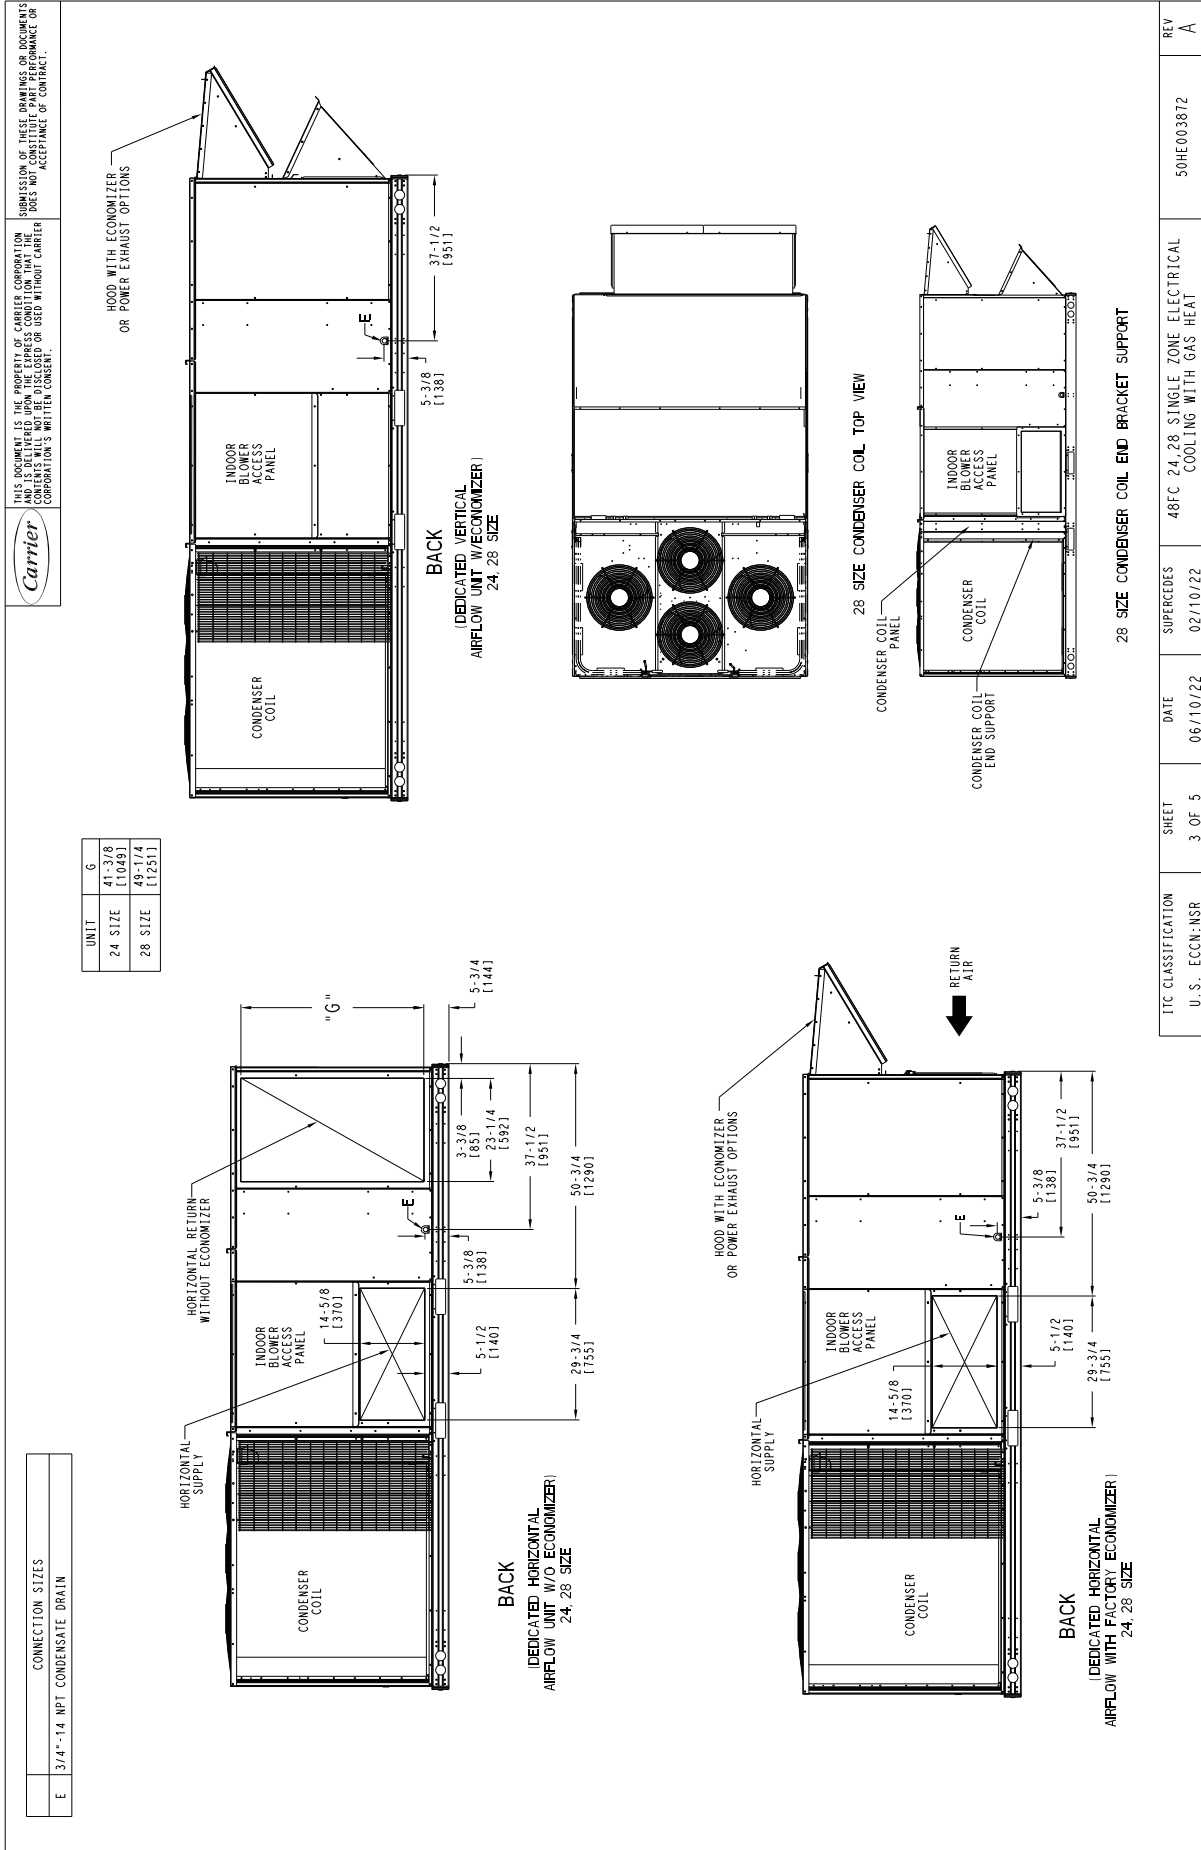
48FC24-28 Base Unit Dimensions (cont)
